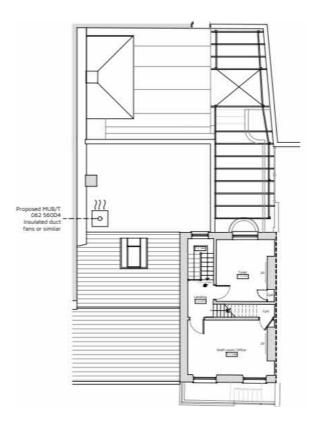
PROPOSED FIRST FLOOR PLAN
